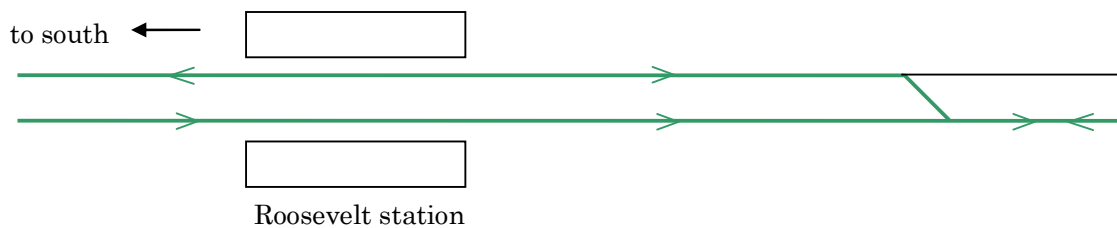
Track Layout of North terminal (Roosevelt)
